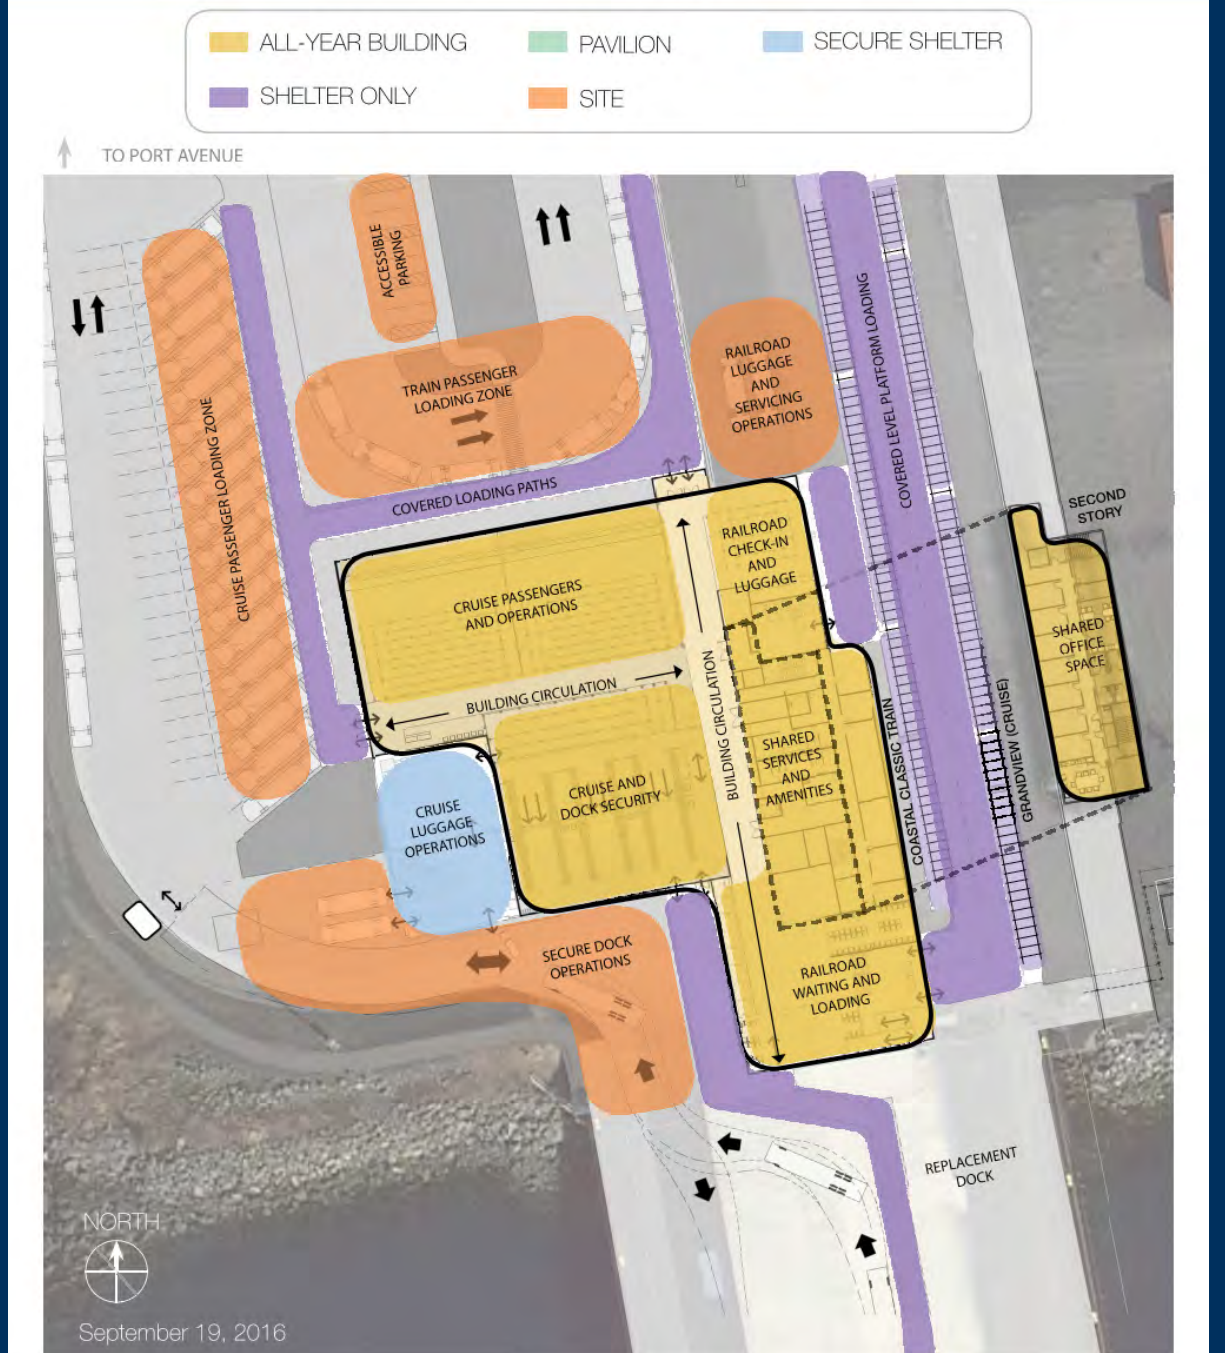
Proposed Internal Layout for Combined Terminal and Depot Building
